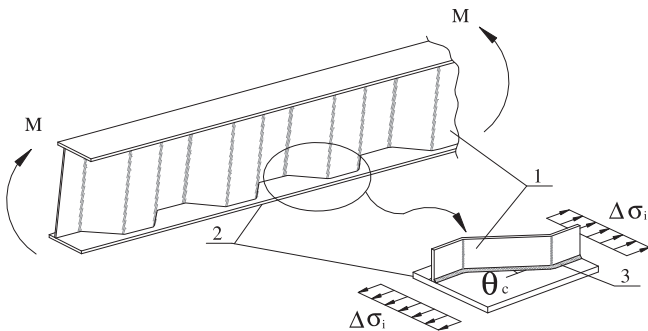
Illustration of a welded joint with corrugated plate.
